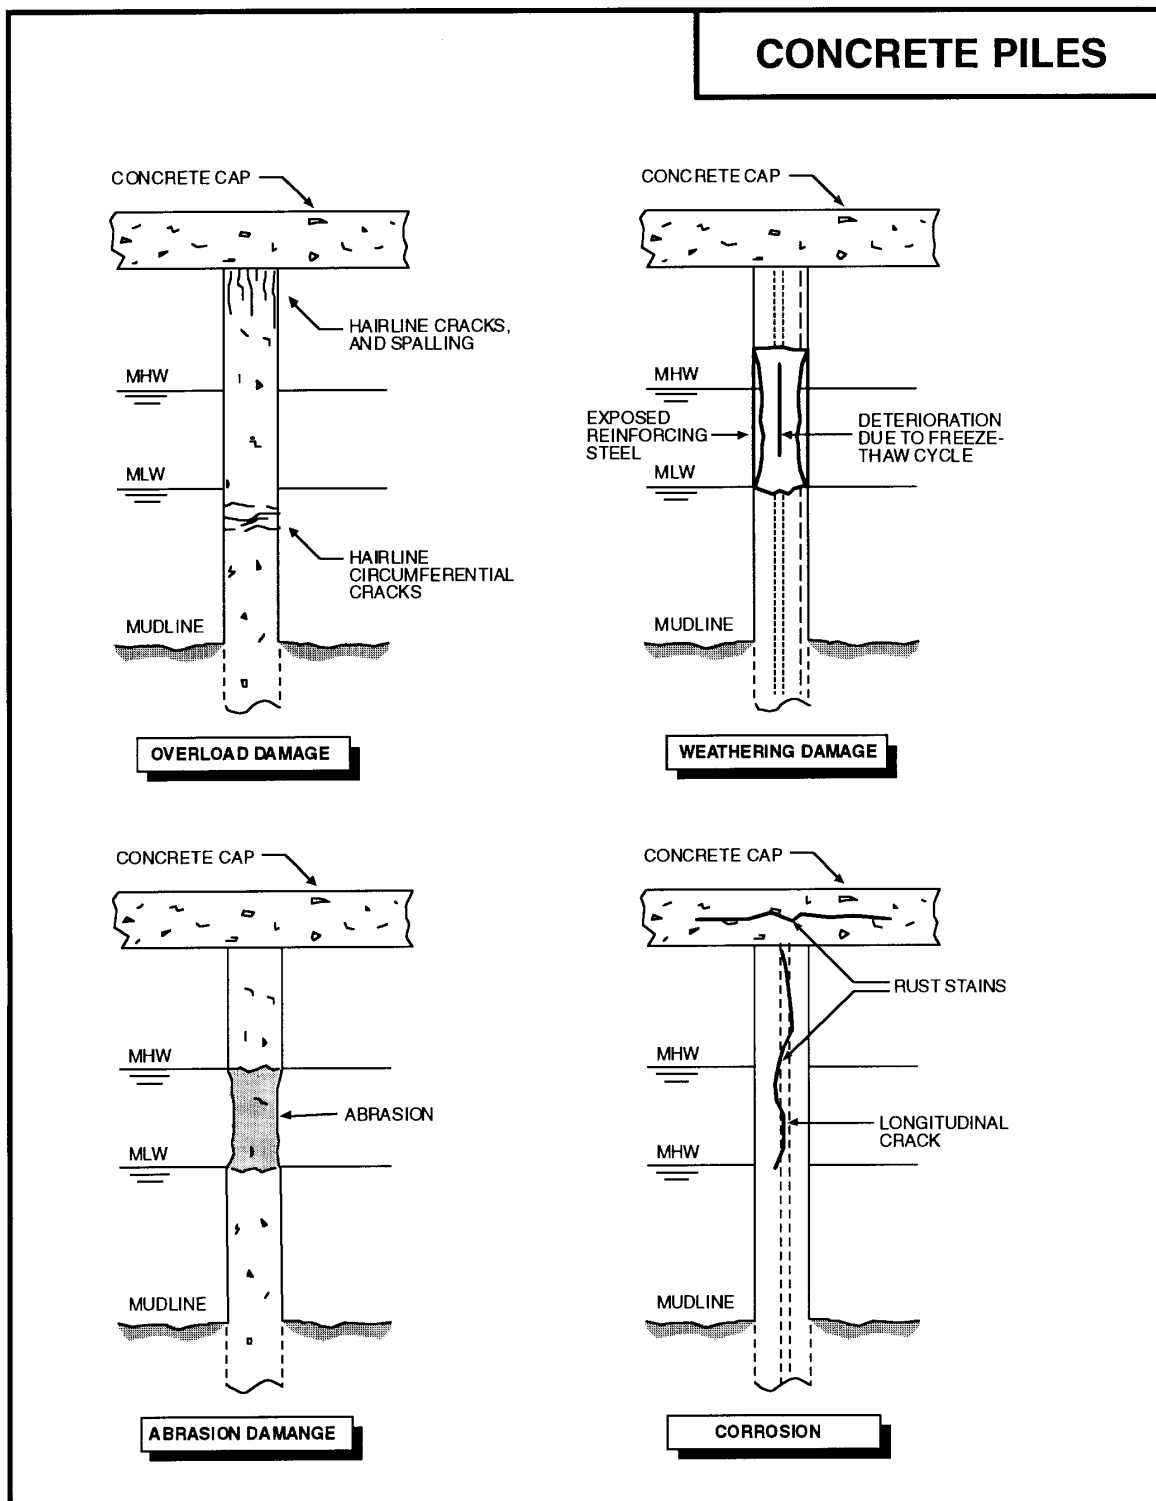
Typical Damage to Concrete Piles from Non-Biological Sources
